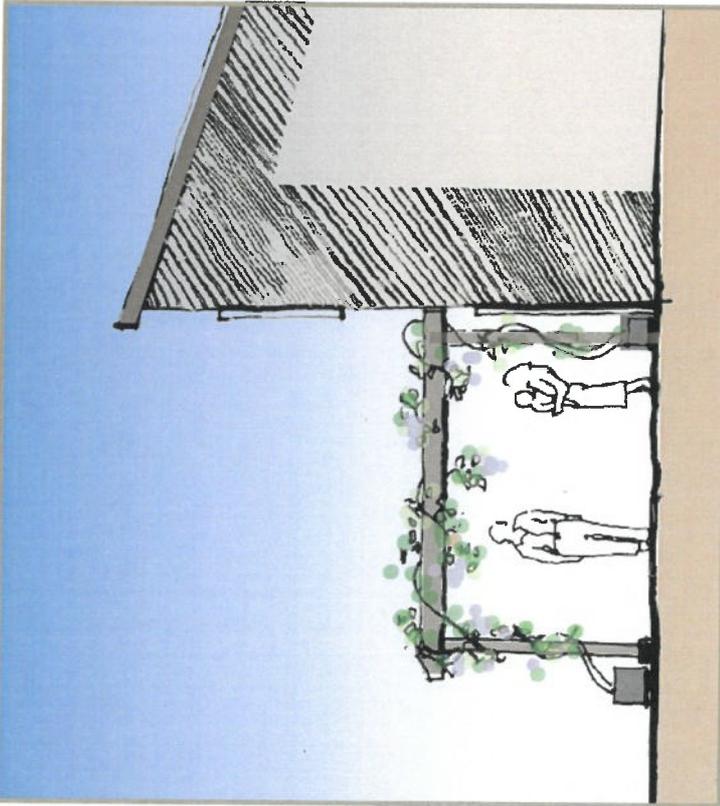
| Offset landscape treatment - architectural element as visual ceiling
